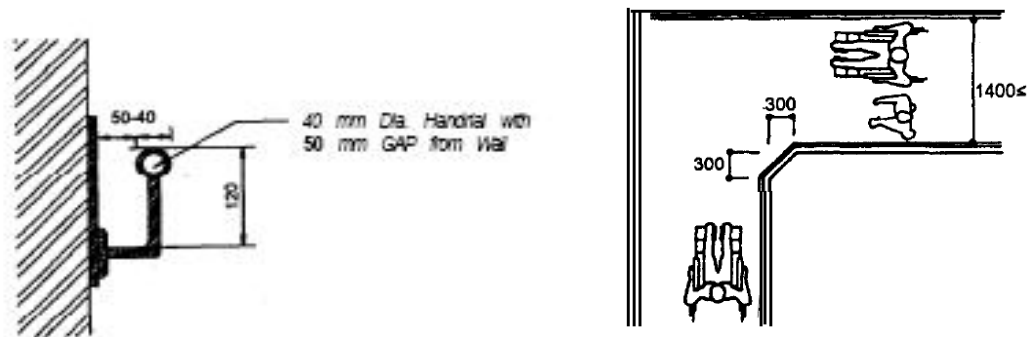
Fixing detail of handrail to the wall. Fig2.21 Passage and corner section
